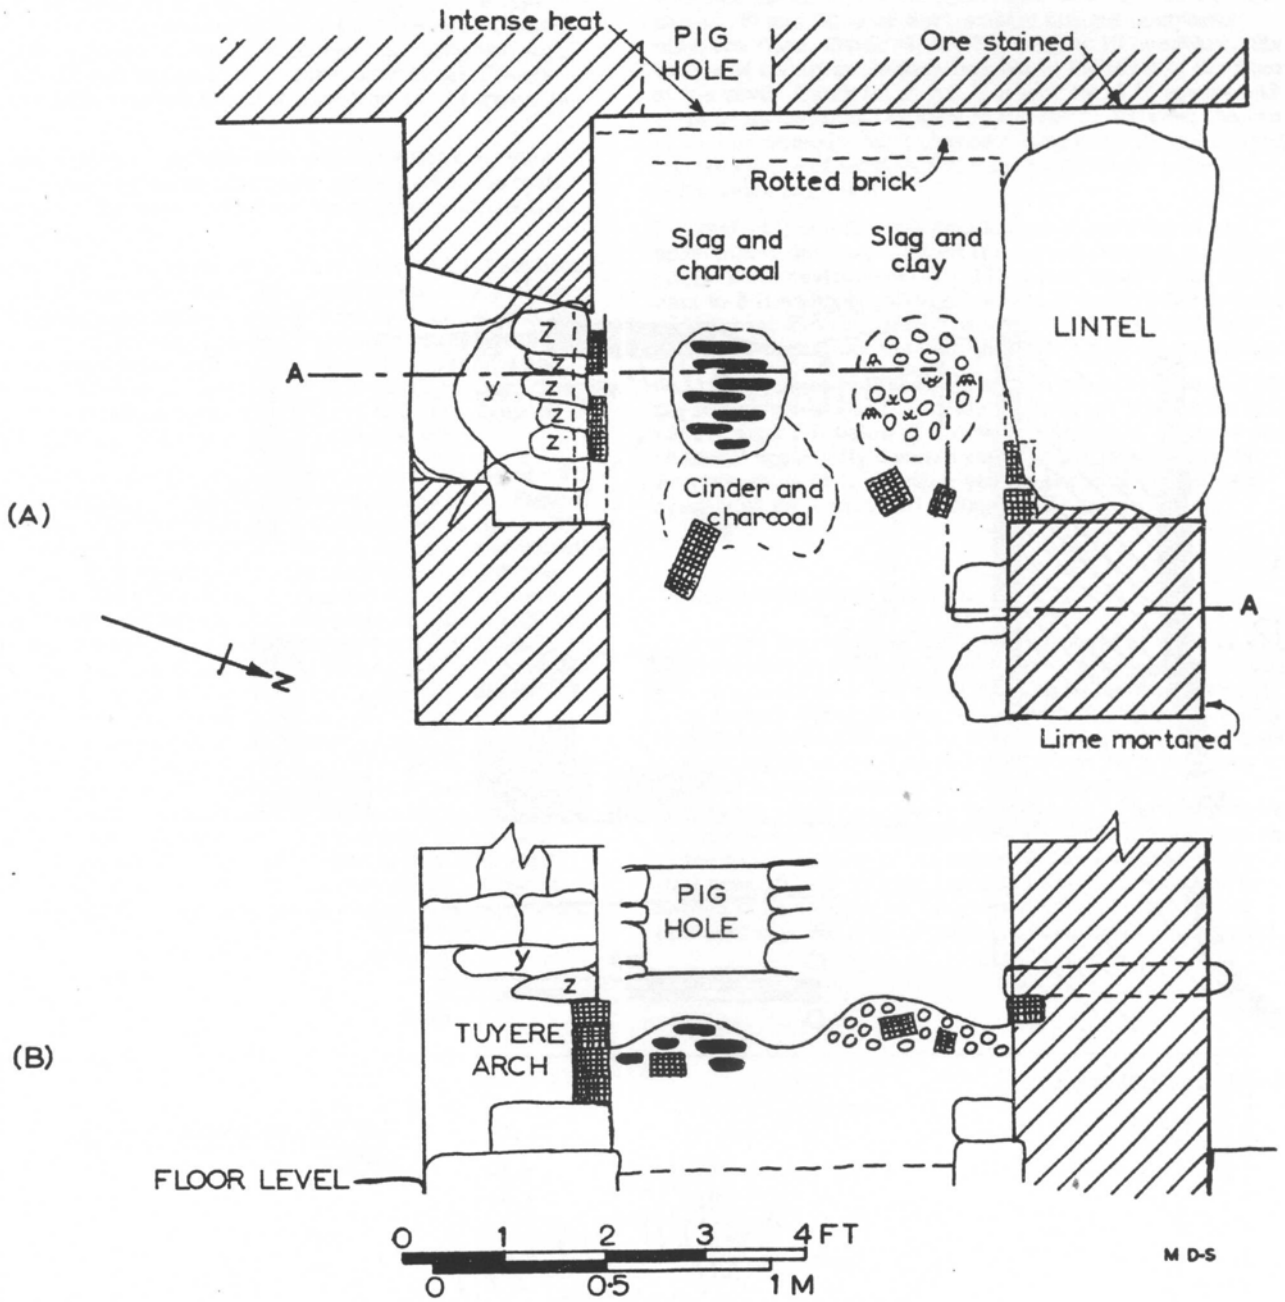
Hearth plan 18 in above floor and section on A-A
